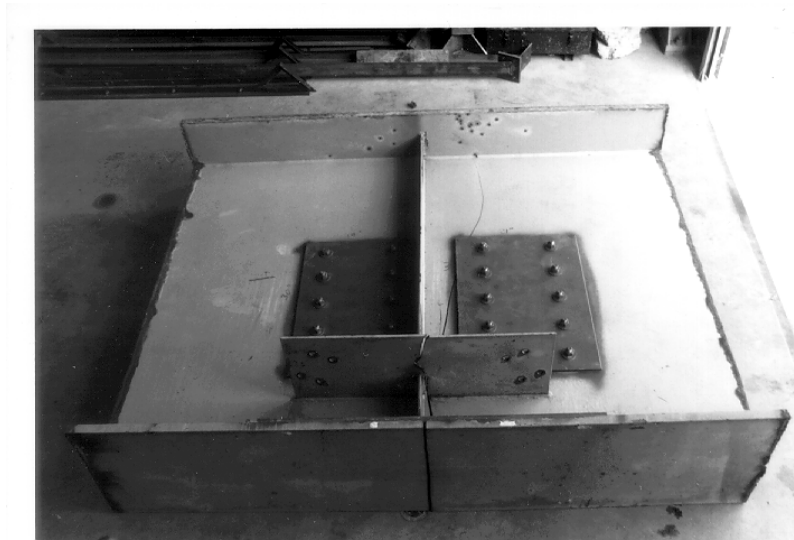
View of cracked bridge girder upon arrival at Purdue University
